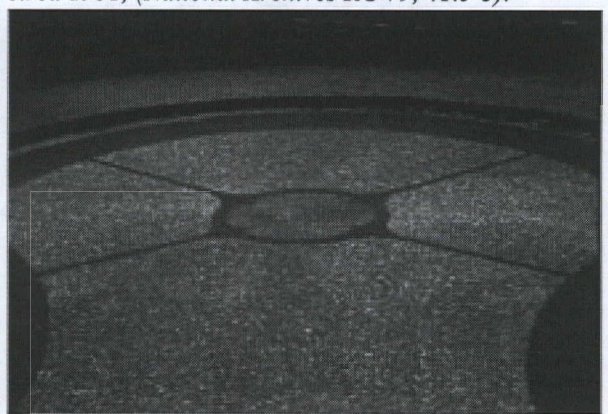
Pavement detail at the 16th Street overlook, 1997, see plan sheet 31 (Land Ethics, Inc.).
